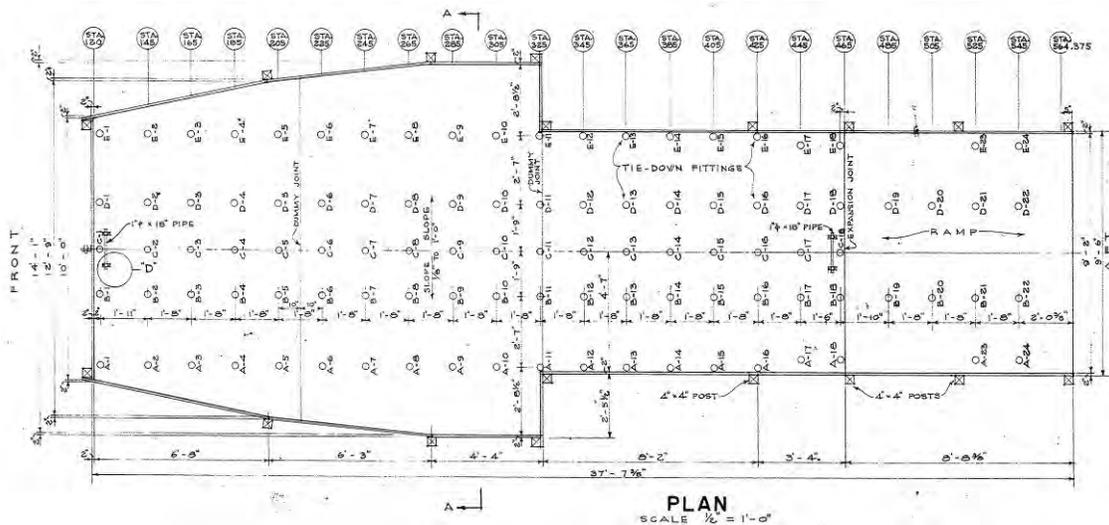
C-123 concrete mock-up for air movement training, ramp plan, Fort Bragg, NC, 1951 (standard drawing 28-13-57a sheet 1 of 1; C-123 mock-up for air movement training, concrete alternate, slab on fill; 7 December 1951).
